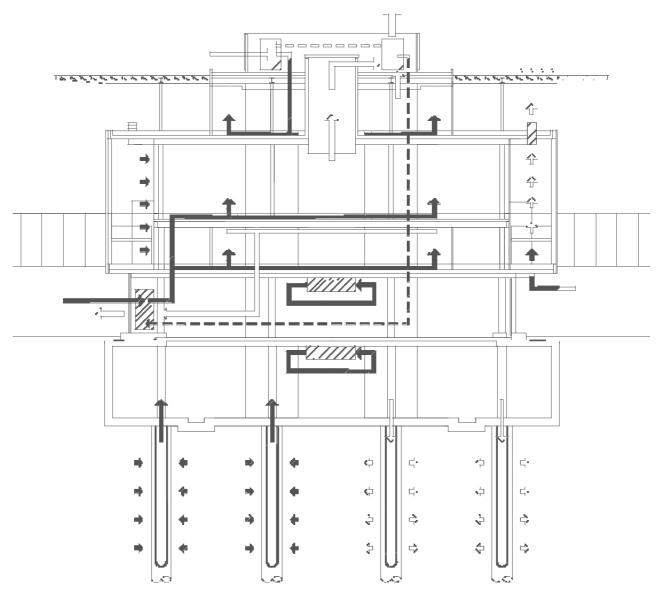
Cross section of the planned Dock Midfield at Zürich airport.
